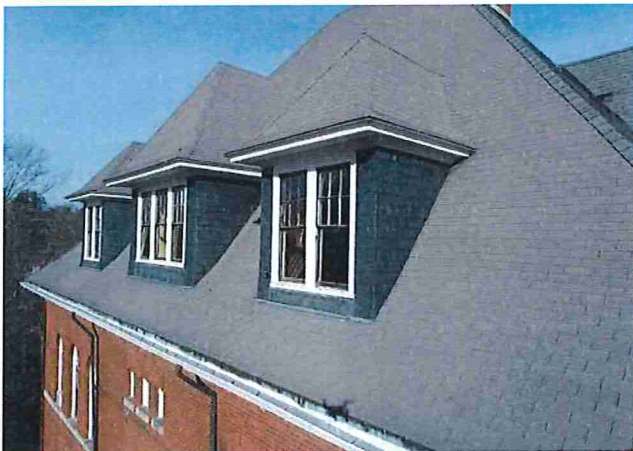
Angled drone image shows loose, damaged and missing slate on the cheek walls as well as on the facades.
